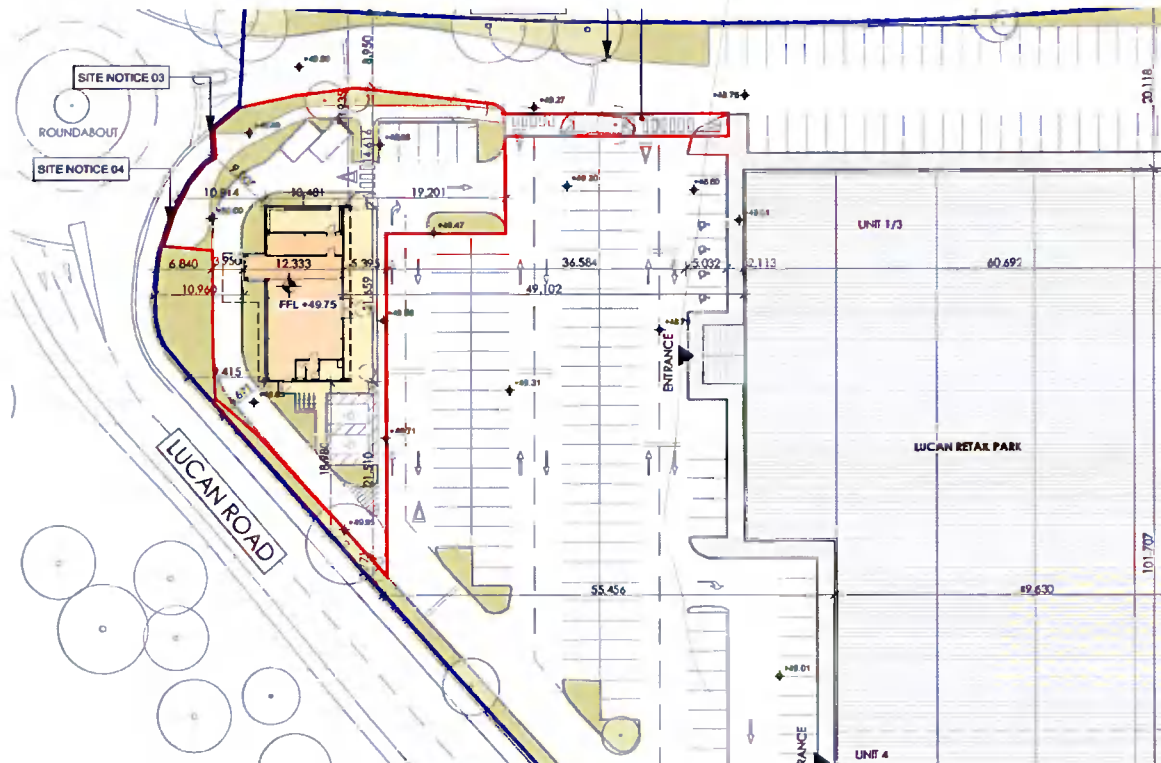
Extract of Site Layout Plan Dwg. No. PO02
